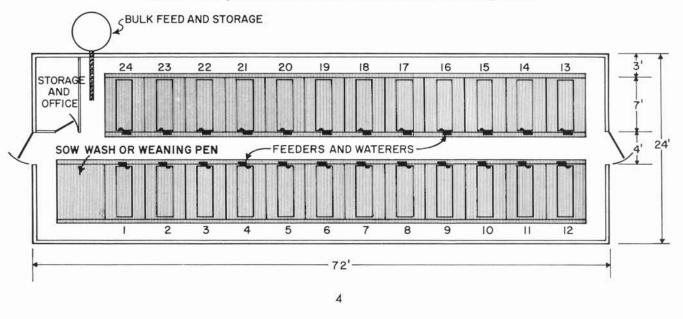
Floor plan and cross-section of slotted-floor farrowing house.
